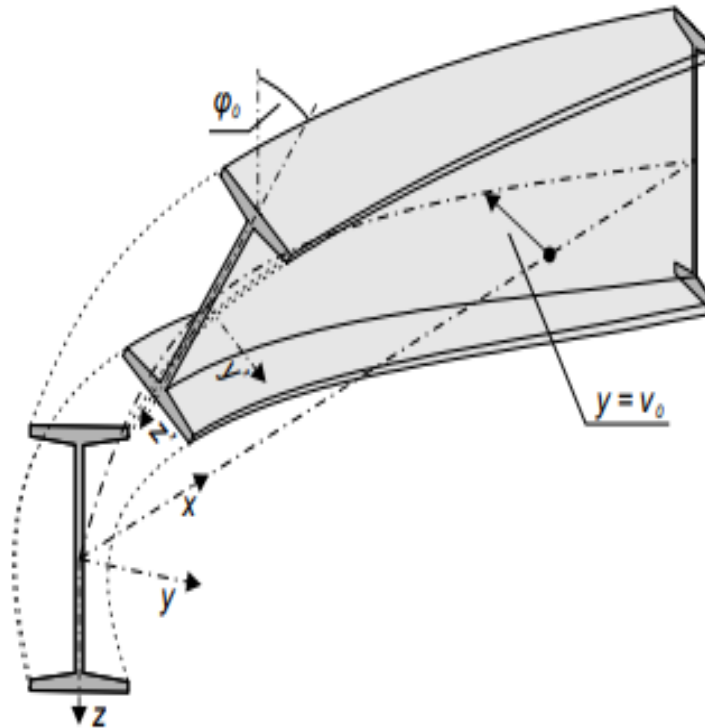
A 3D view of I-beam deflecting [11]
